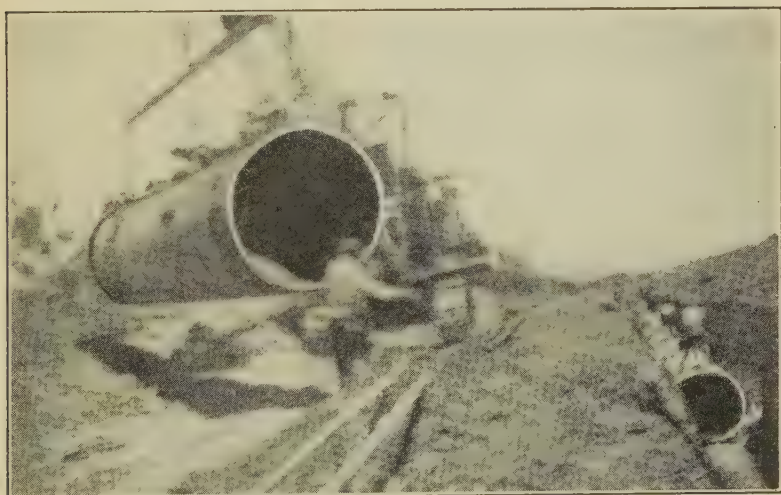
Lowering section of arc-welded pipe in trench.
